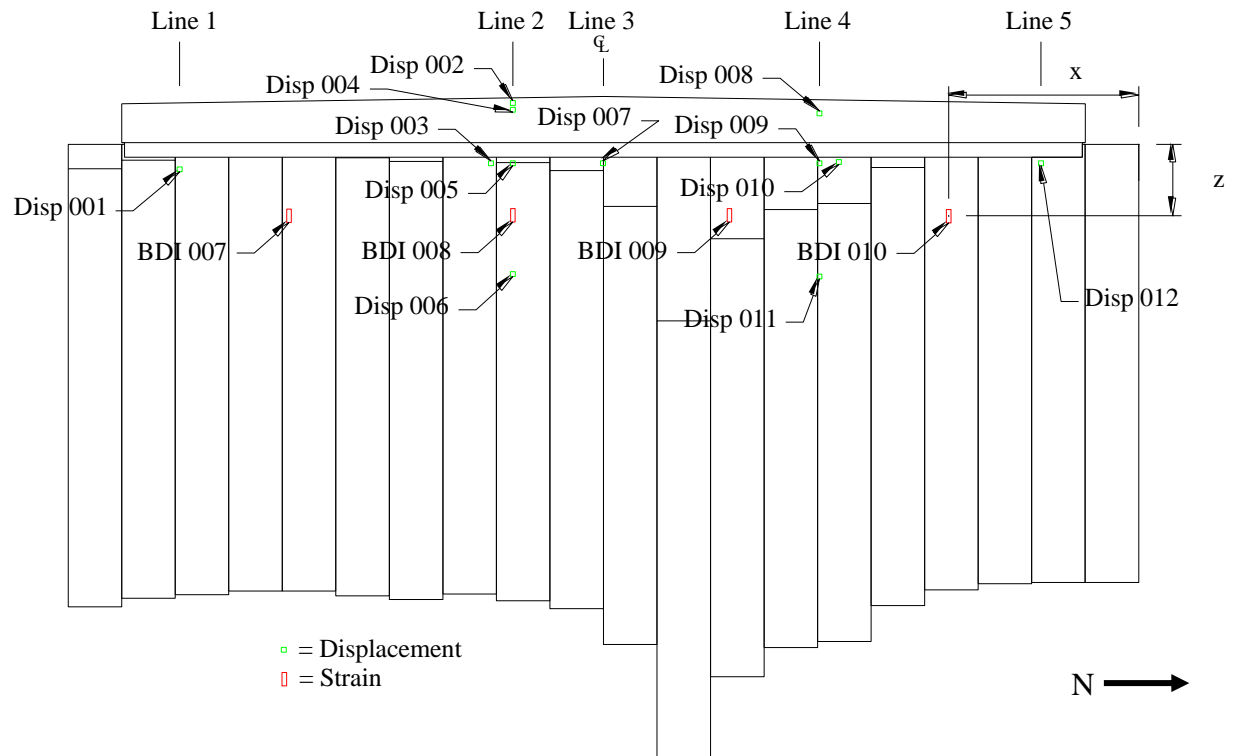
Strain (BDI) and displacement (Disp) instrumentation placed on west abutment system wall for bridge live load testing
